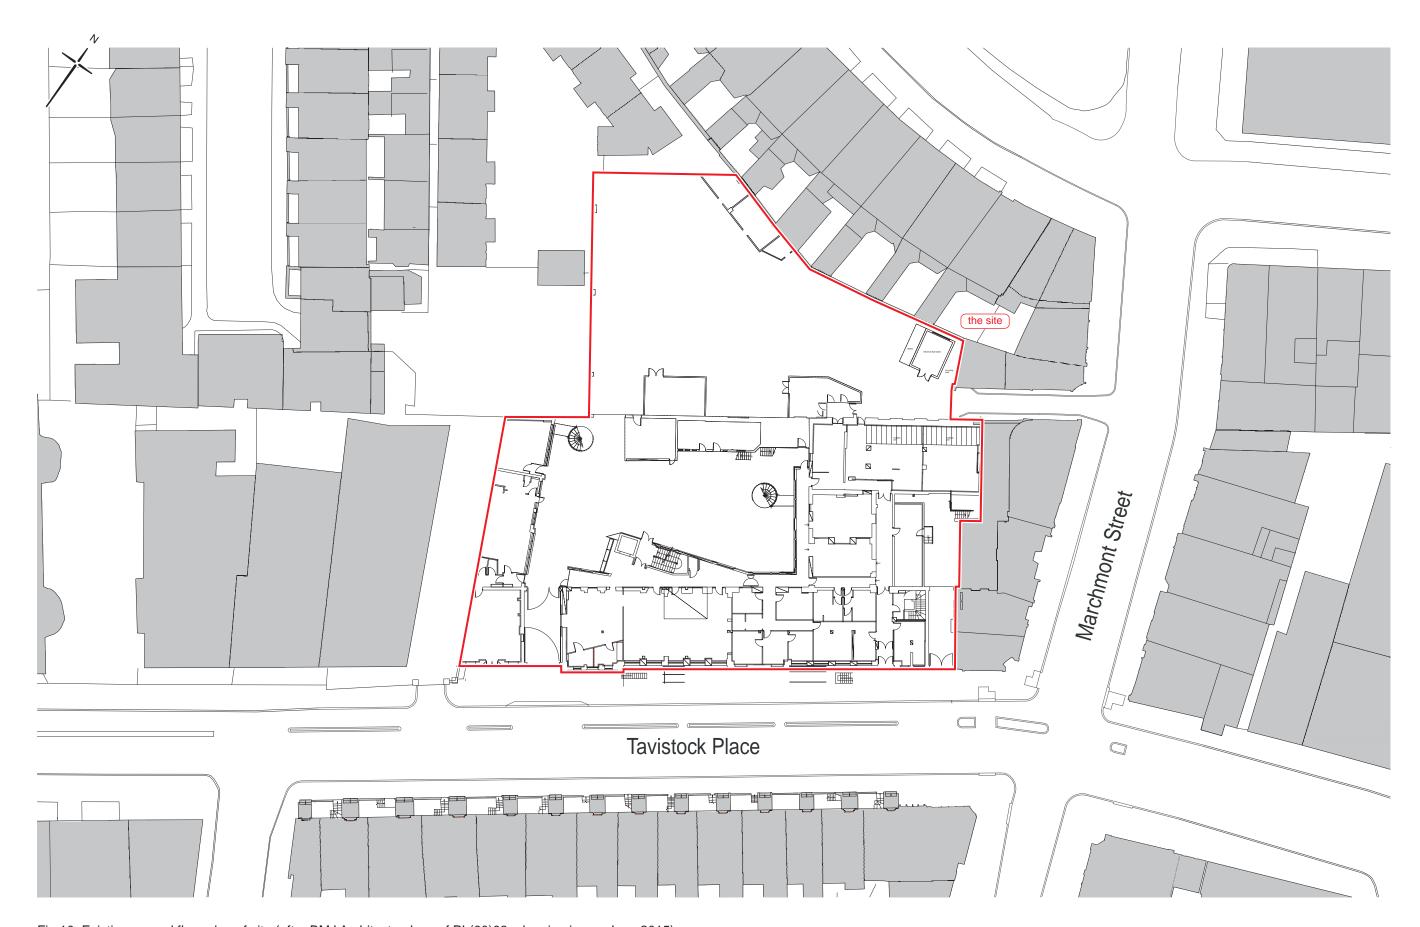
Existing ground floor plan of site (after BMJ Architects, dwg ref PL(00)03, planning issue, June 2015)
